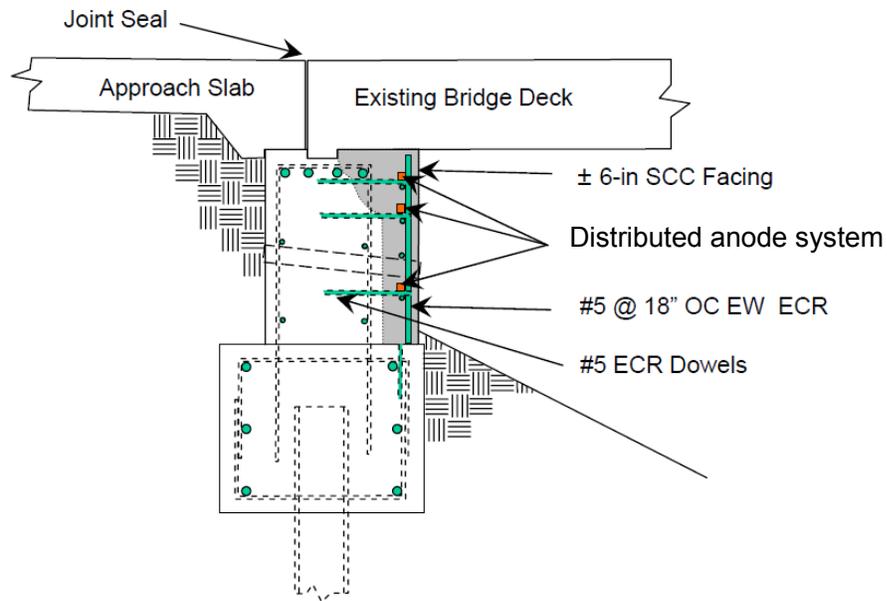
Cross-sectional detail of the abutment rehabilitation system.
